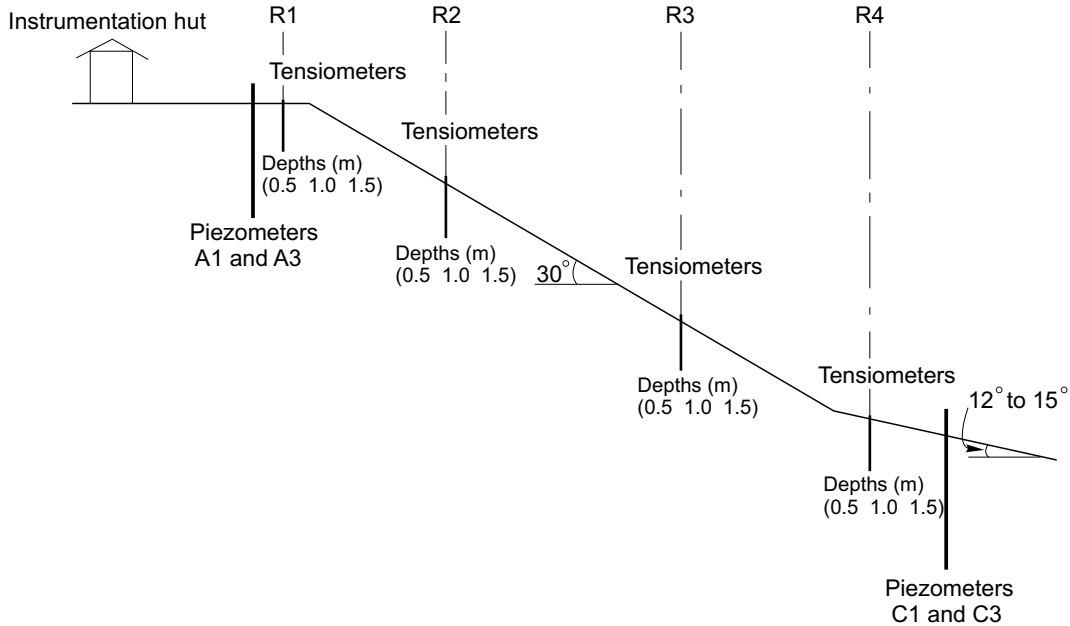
Cross-section of the instrumented slope showing instrumentation details.
